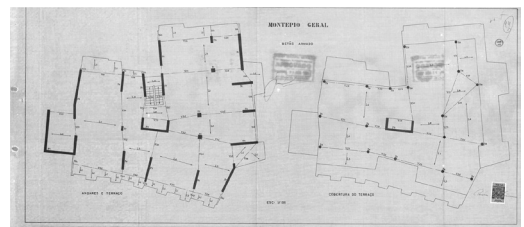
Montepio Geral building, structural schemes of floorplans, terrace and roof (CMPorto&Ricca Gonçalves 1961).
